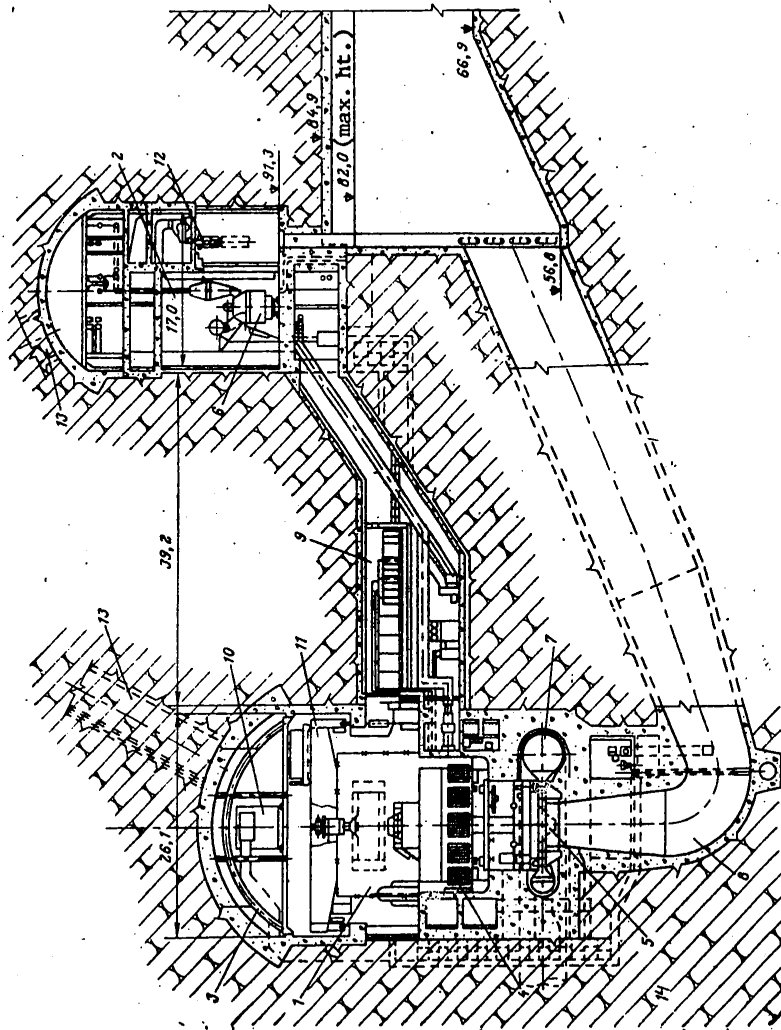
Underground Building of the Station of the Rogunskaya GES. 1--machine room; 2--transformer compartment; 3--protective arch; 4--generator; 5--turbine; 6--transformer; 7--steel reinforced concrete volute chamber; 8--suction pipes; 9--tunnels of connecting wires; 10--air conditioner; 11--overhead crane; 12--monorail car; 13--exhaust shaft; 14--sandstones
